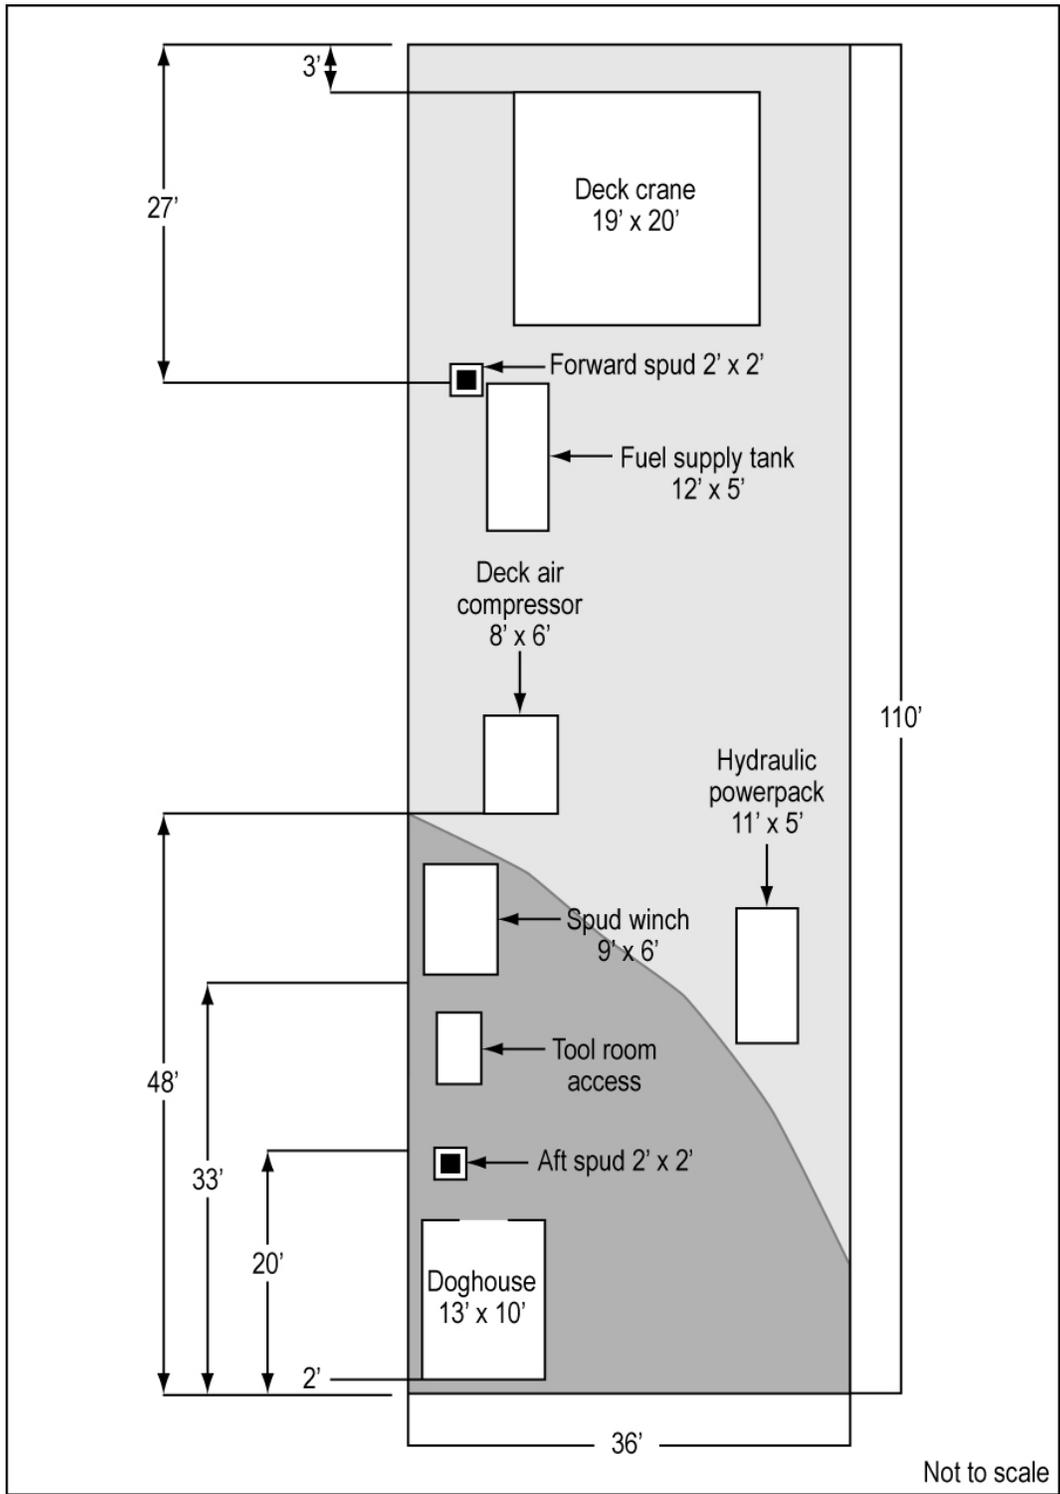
General layout of *Athena 106* construction barge. Fire damage to equipment on the barge deck was greatest in the dark-shaded area.
